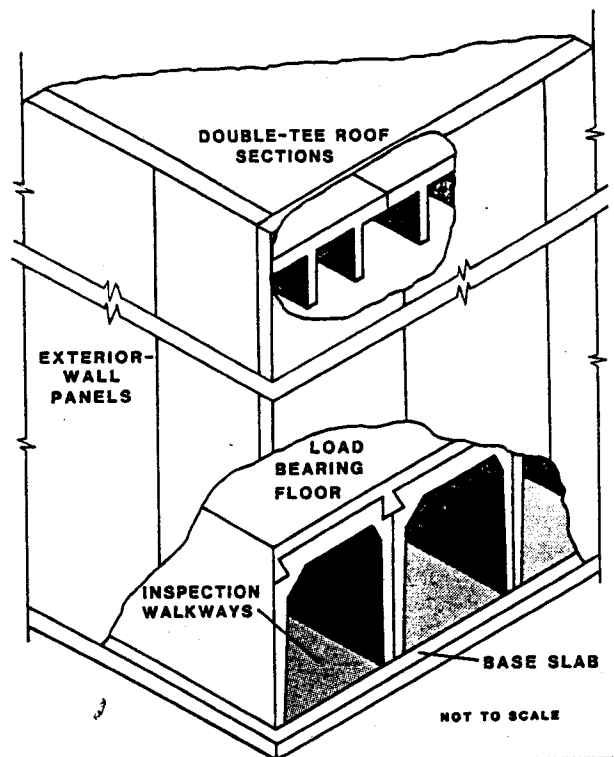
Sectional perspective of structure showing base slab, inspection walkways, and double-tee roof sections.
